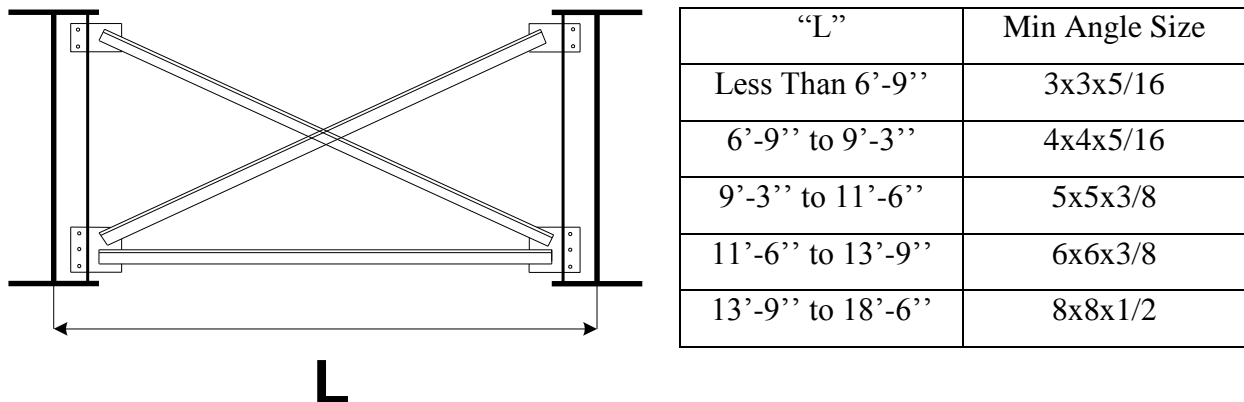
Steel beams selected, with welded extension plates
